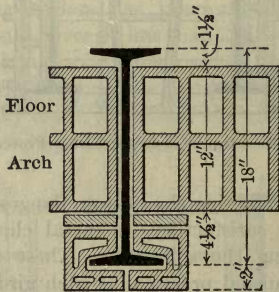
Single I-Beam Girder Protection, Cadillac Automobile Factory, Detroit.
